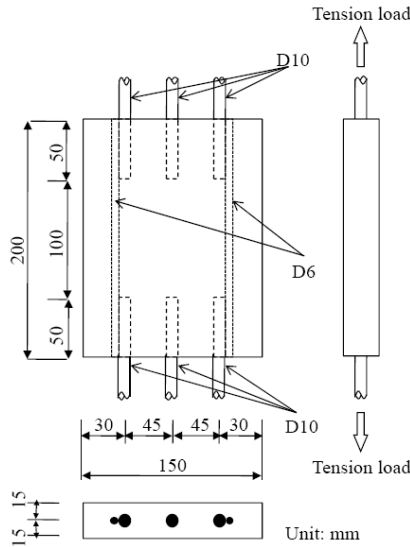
Uni-axial test setup used by Morimoto *et al.* [2.25]
